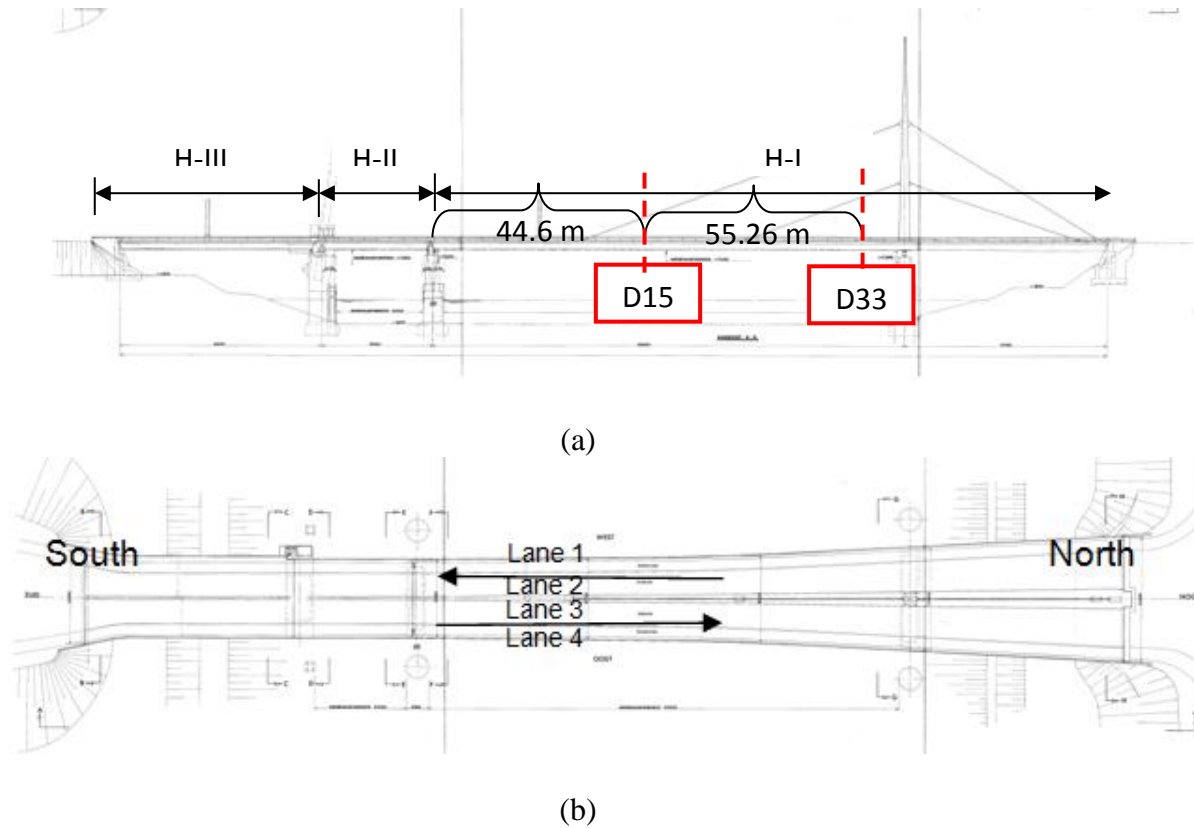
Individual codes for each structure and lane configuration of the steel bridge system: (a) Plan; (b) Elevation
